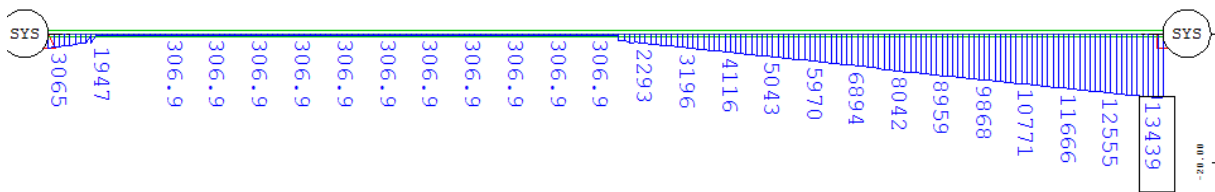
Longitudinal reinforcement after 3rd optimization step, cantilever phase, concrete variant
